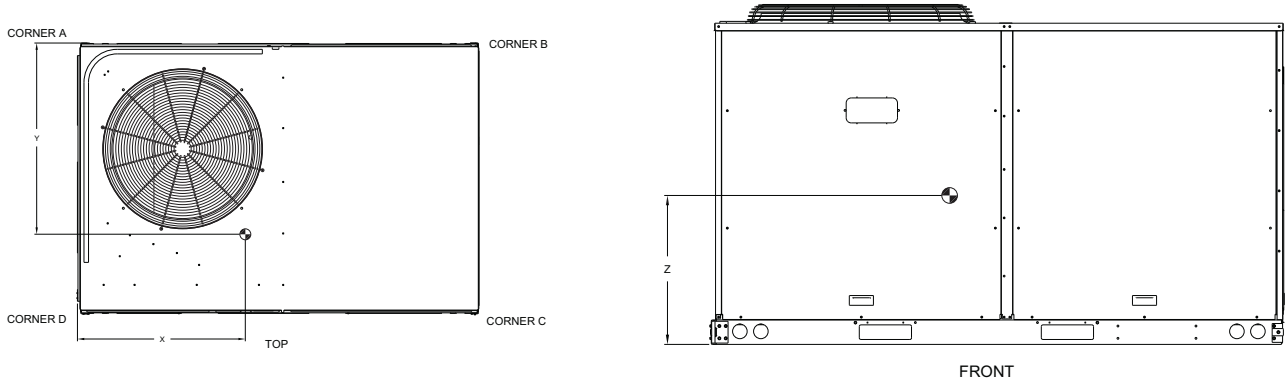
Dimensions RAS150 (Sheet 2 of 2)
